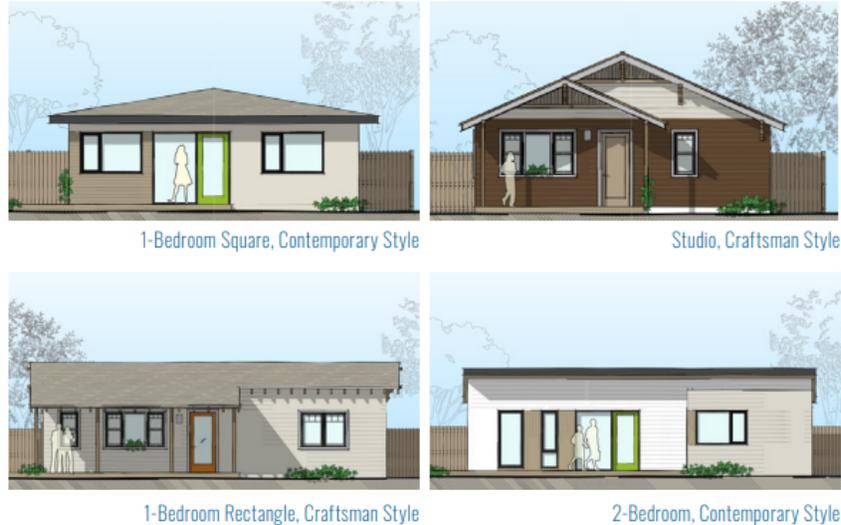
Style Elevations ([HEART-GLADUR ADU Handbook](#))
